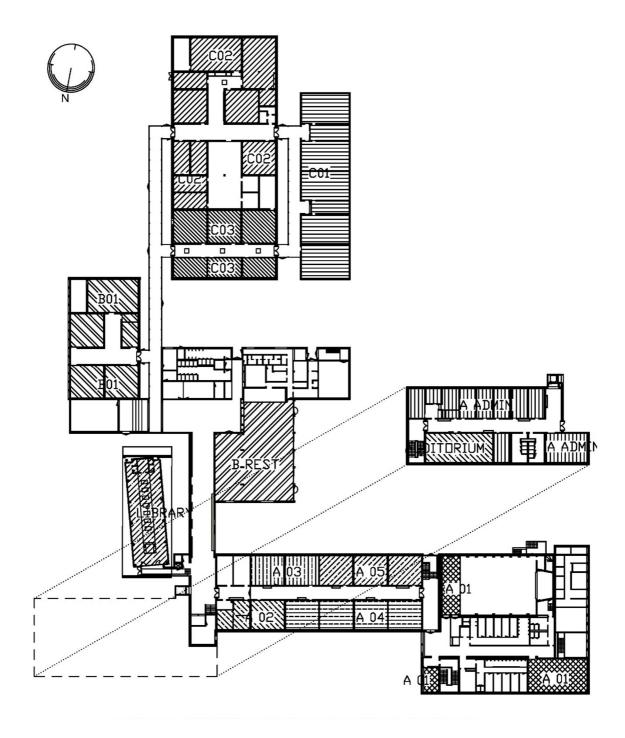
Simplified floor plan of the school buildings (level -1: A, B, C and level 2: A) and main thermal zoning (AHUs plan distribution)
